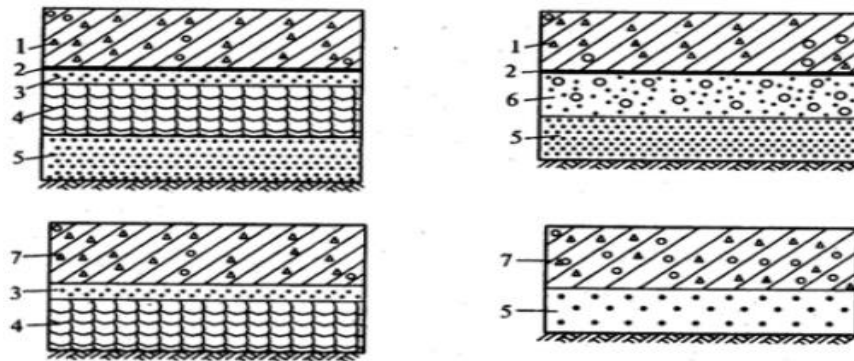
Crushed stone and gravel-based cement concrete pavements:
